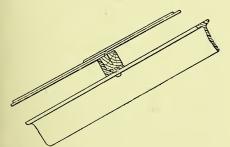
Slates Centre-Nailed to Angle-Iron Purlins on Steel Roof.
